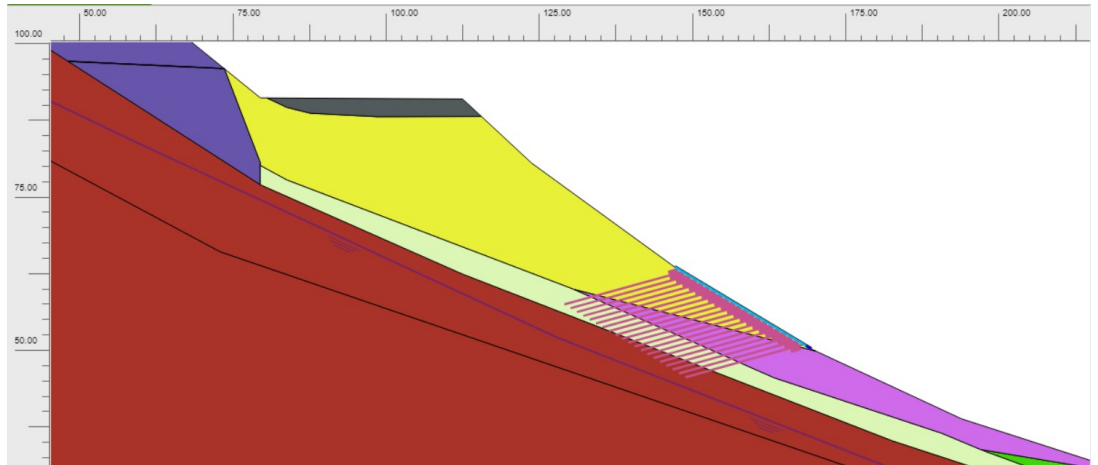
Soil Nail layout with 1.2m spacing and 15 degree inclination
